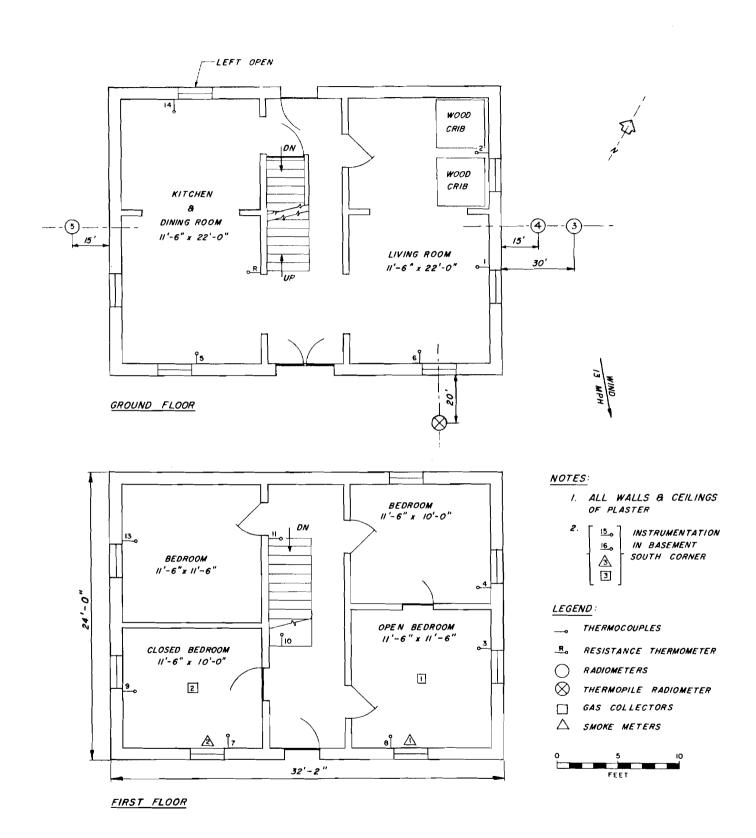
BUILDING No. 7 - TWO - STOREY SOLID BRICK DWELLING
